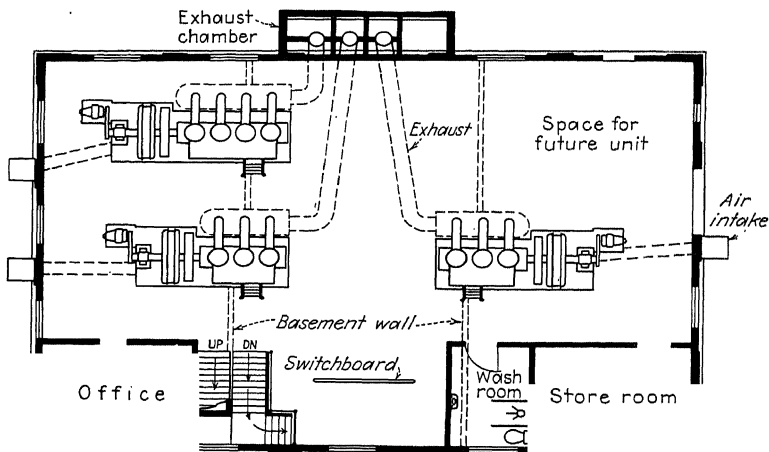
Floor plan of plant not readily expanded to house more than four units.
